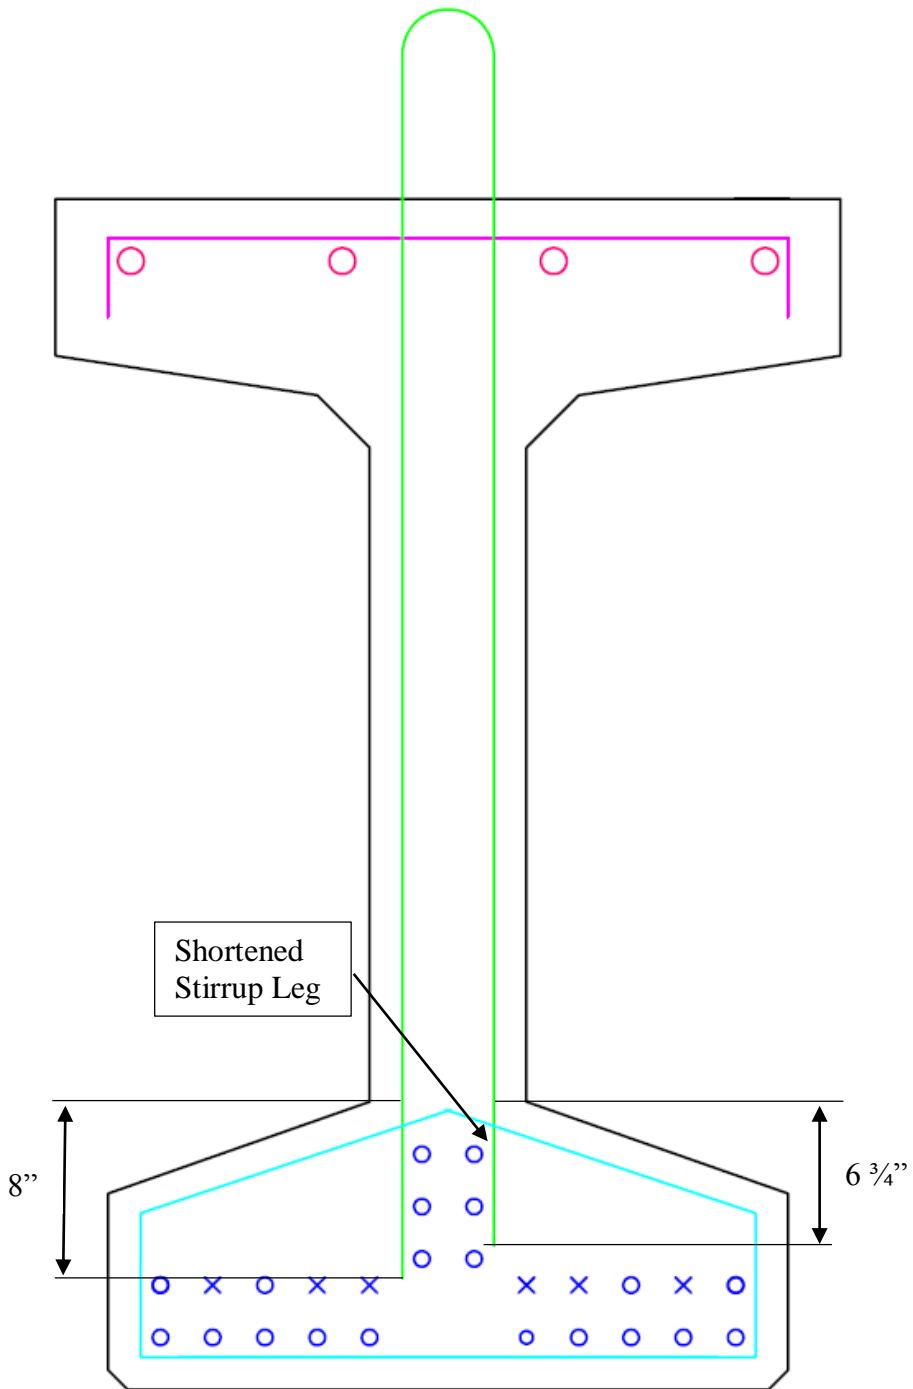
Stirrup leg anchorage depths for the 45M girder representing the typical anchorage depths for an M-shaped girder.
